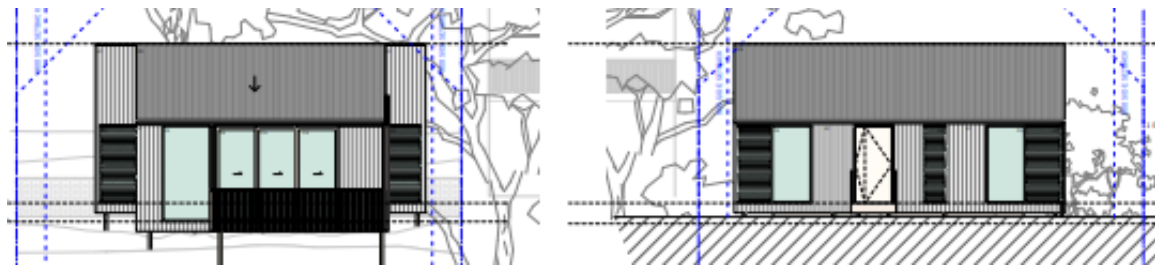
Eastern (rear) and Western (front) elevation of secondary dwelling (source - Adriano Pupilli Architects)
